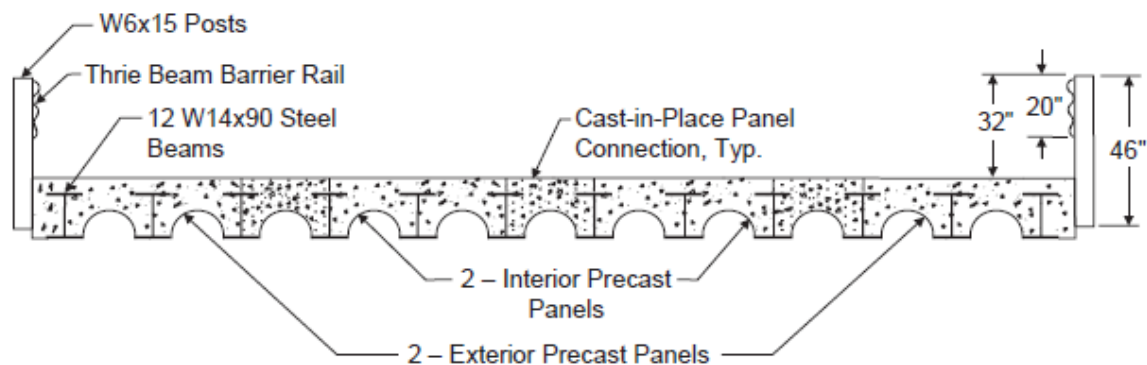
Typical cross section of a completed PMBISB (Konda, 2007)
